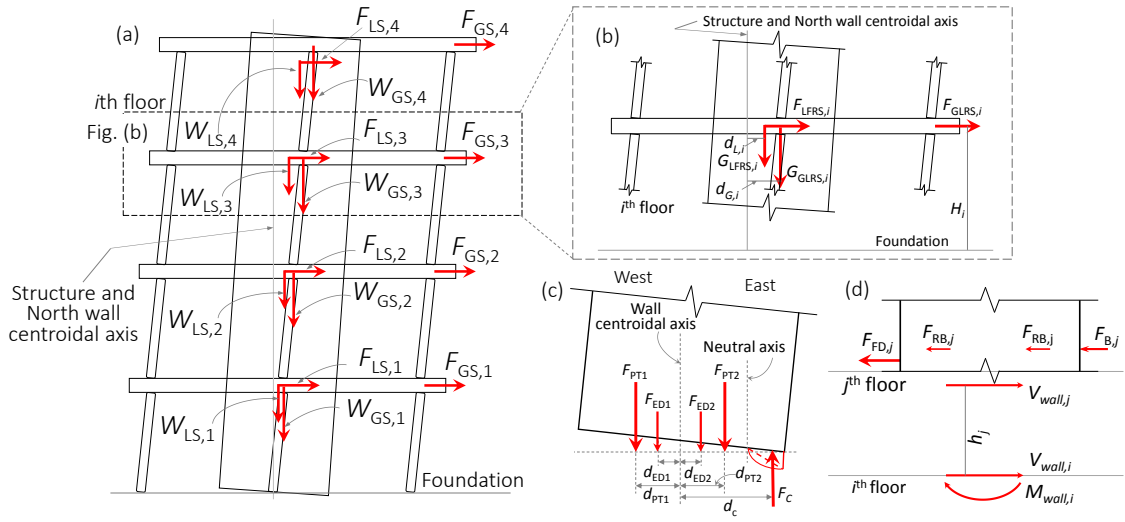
Force calculation diagrams: overturning: (a) structure; (b) at i^{th} floor; (c) wall base moment; (d) wall shear force and moment at i^{th} floor.
